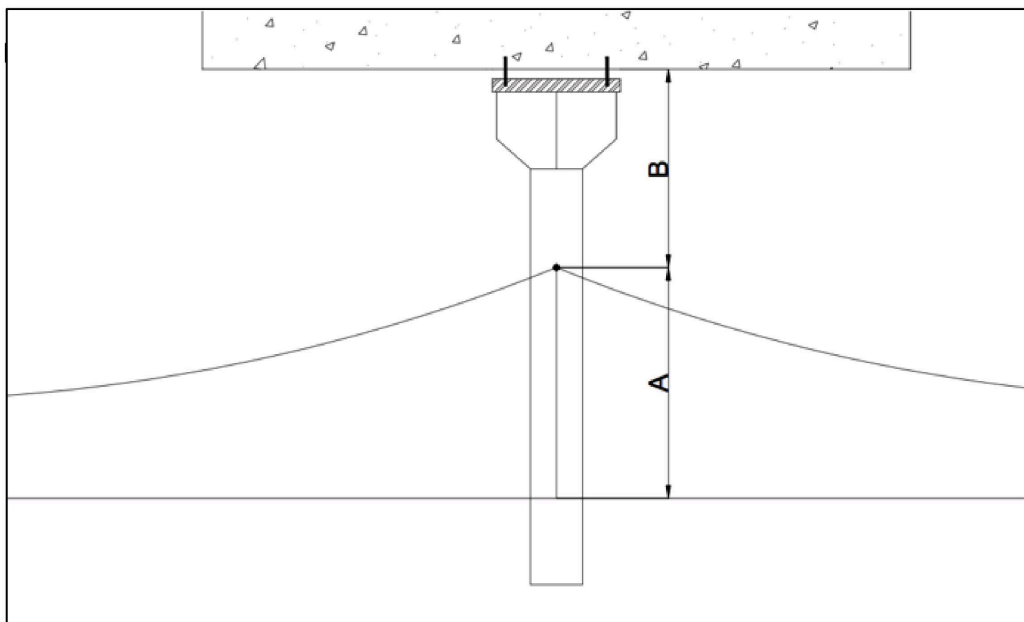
Cantilever suspended from concrete beam (different fixing arrangement)
